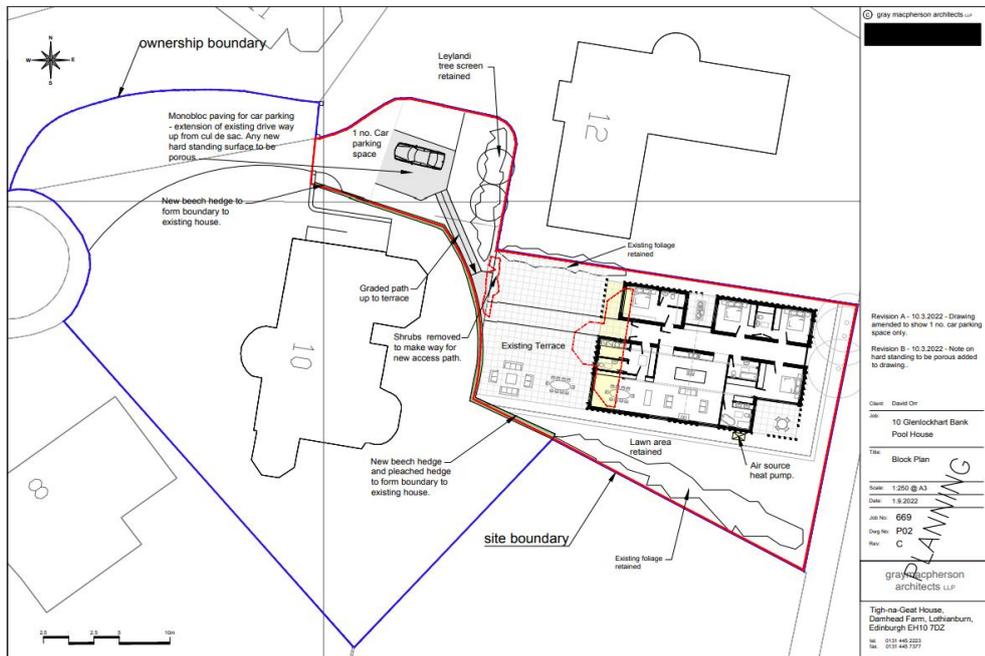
Extract from Proposed Block Plan P02 (Revised) (GMA)
